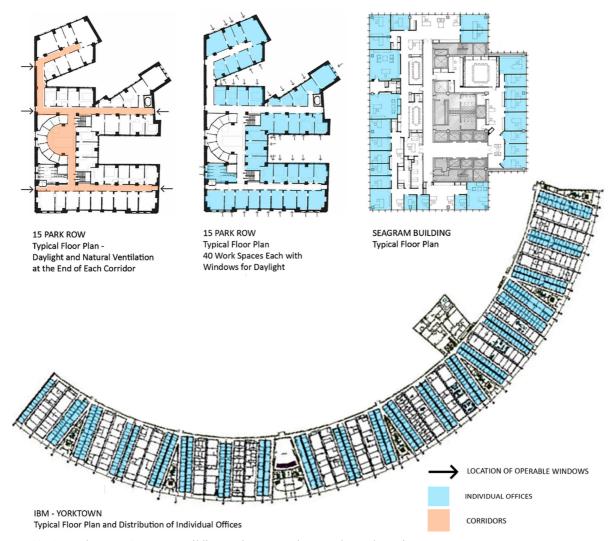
15 Park Row, Seagram Building and IBM Yorktown Floor Plan Diagrams.
